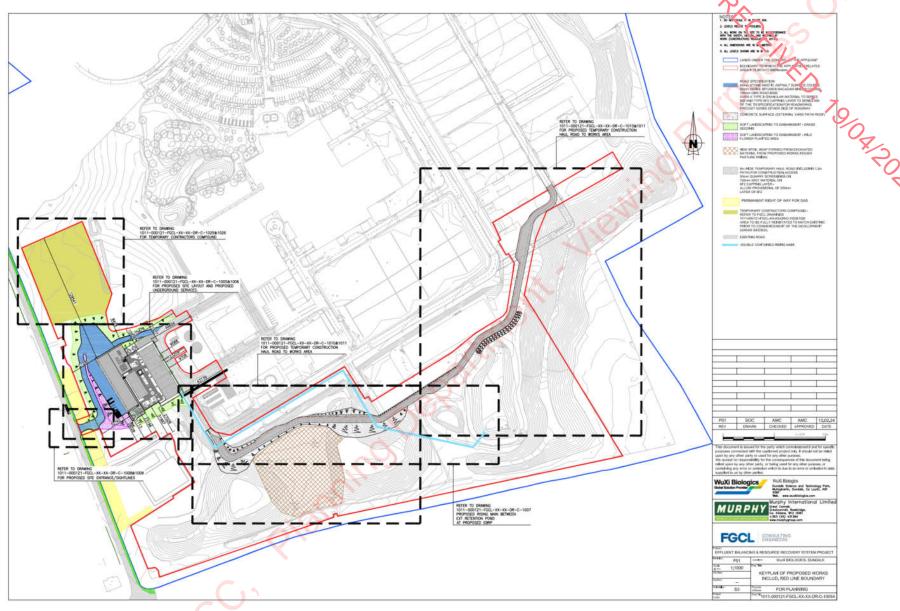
Proposed Layout (1 of 2) (note: layout is indicative)
